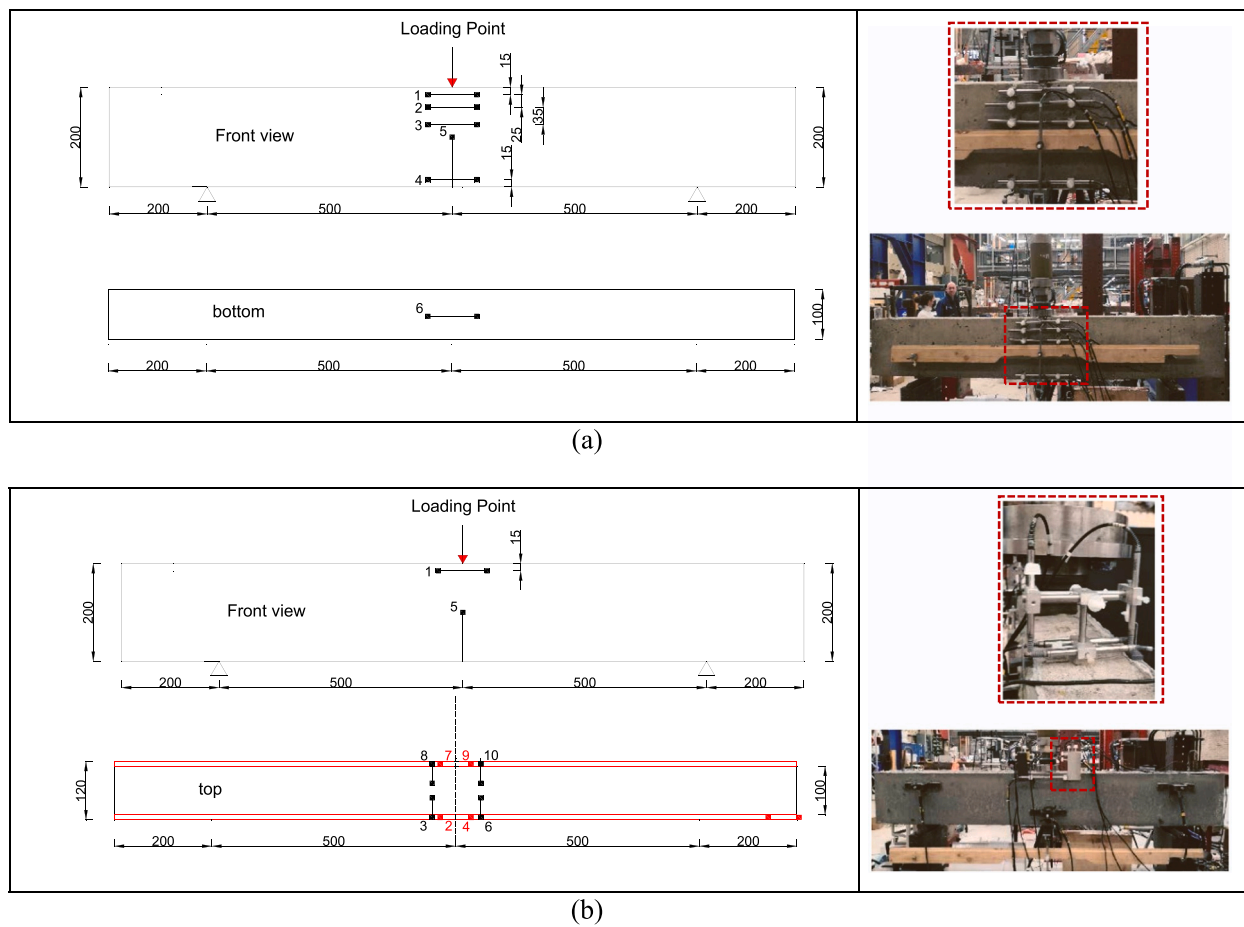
Schematic of the test setup and LVDT arrangement: (a) LVDT arrangement for reference beam; (b) LVDT arrangement for hybrid beam (Unit: mm).
